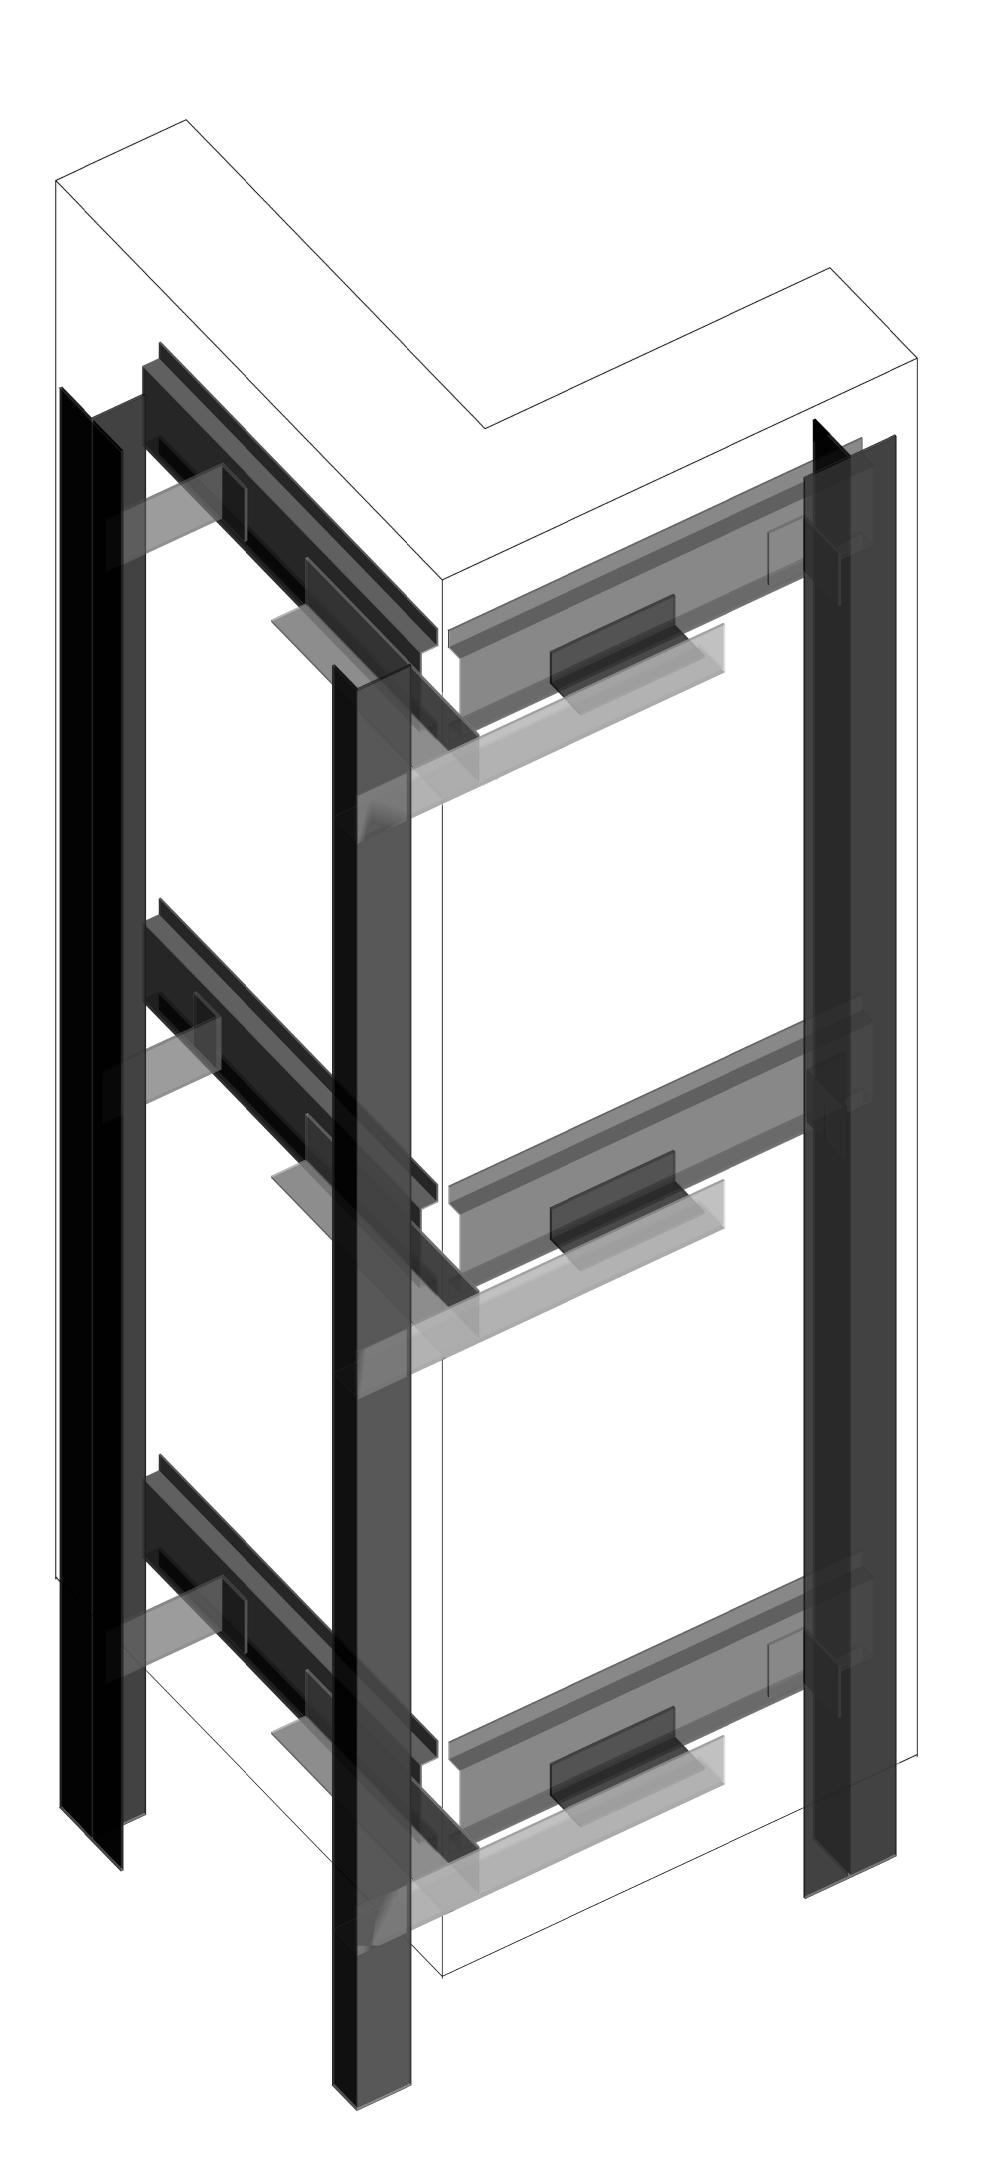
DETAIL A - TYP. OUTSIDE CORNER DETAIL
